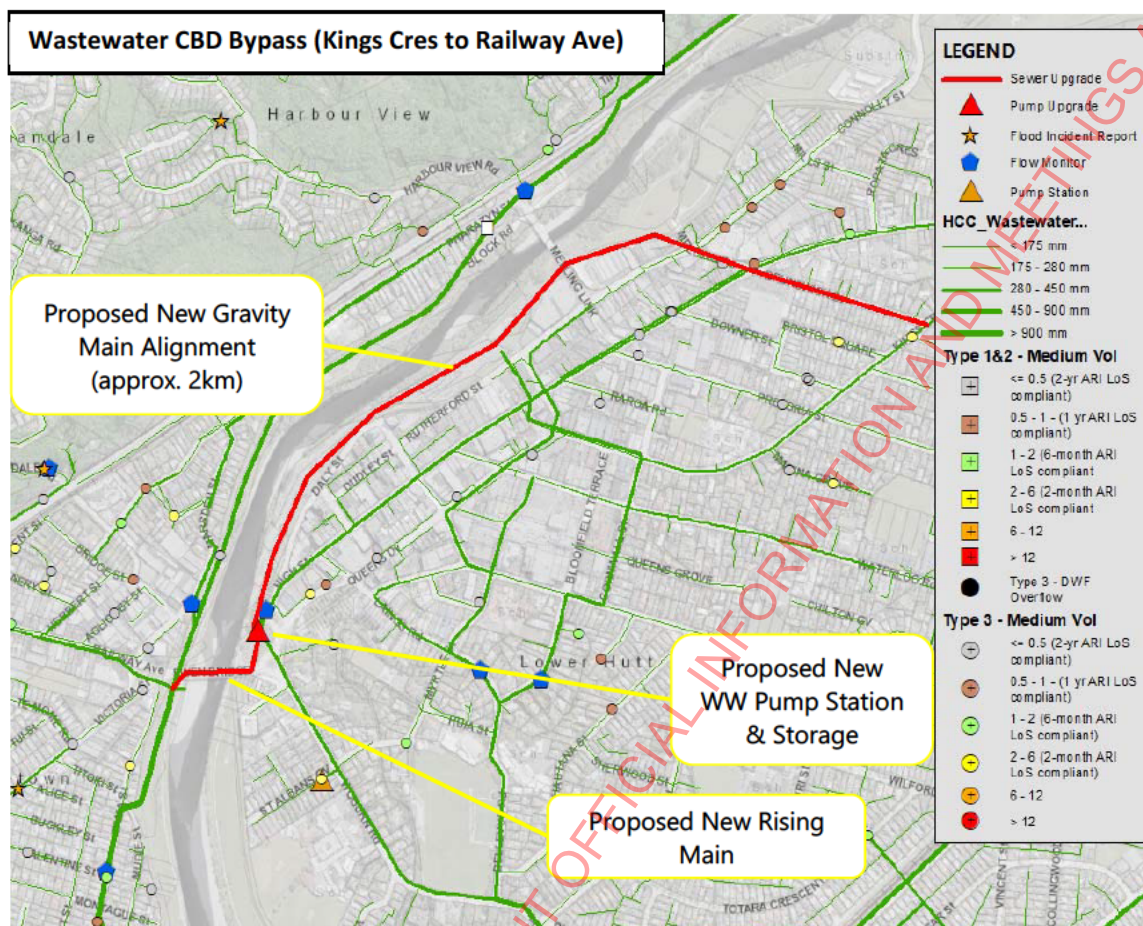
Proposed Wastewater CBD Bypass (Kings Cres to Railway Ave)
